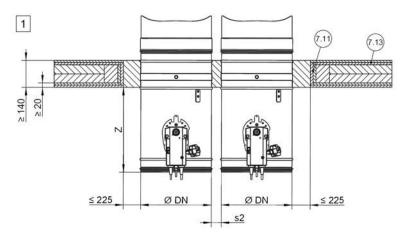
Mortar-based installation into a lightweight partition wall, half-timbered construction
